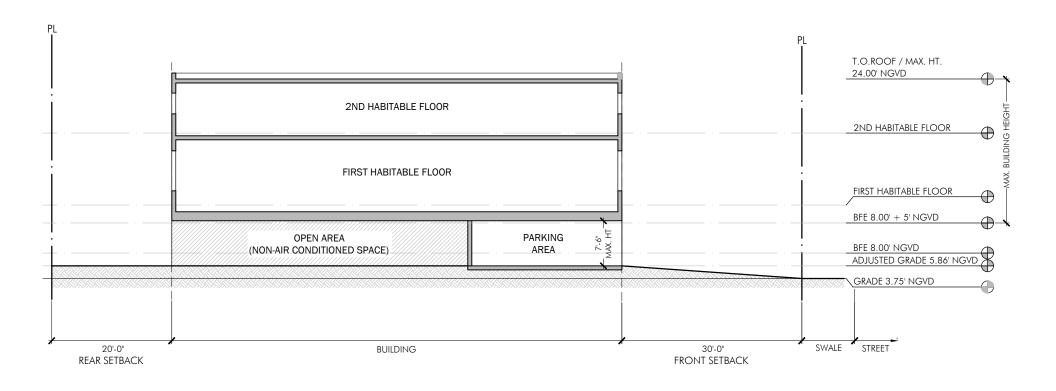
EXHIBIT D: EXISTING CODE 100' LOT (SITE PLAN)
